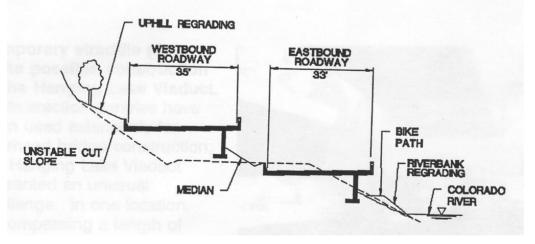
Typical section, terraced alignment, from DMJM, (1993).
